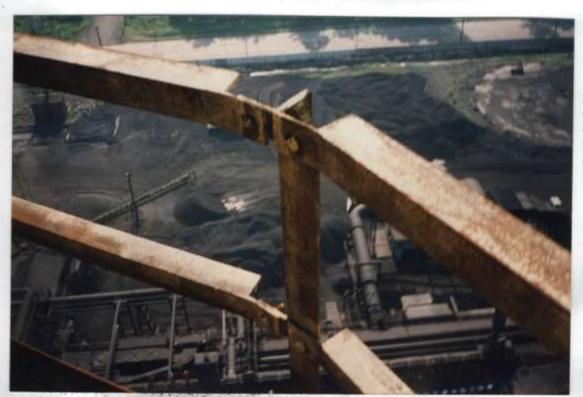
Close up view of the top platform handrail. Note the steel is rusting freely.
